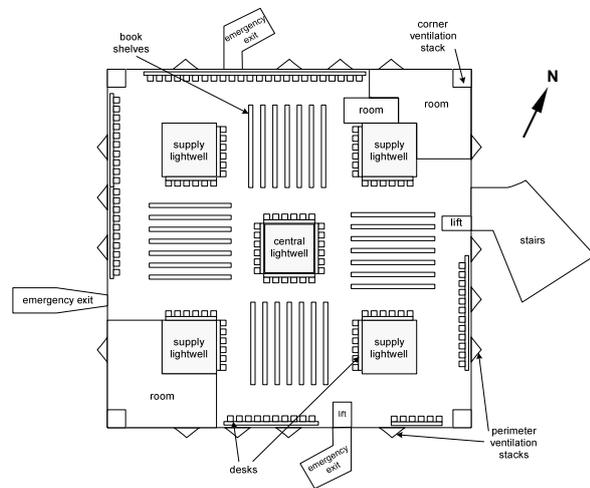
Typical floor plan, showing basic library layout and ventilation lightwells and stacks
